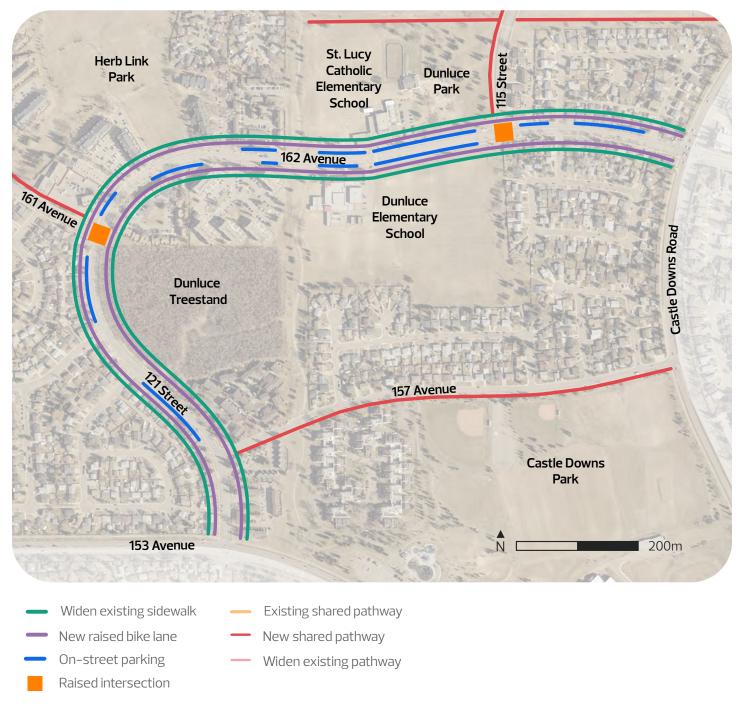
Conceptual plan – 121 Street and 162 Avenue
